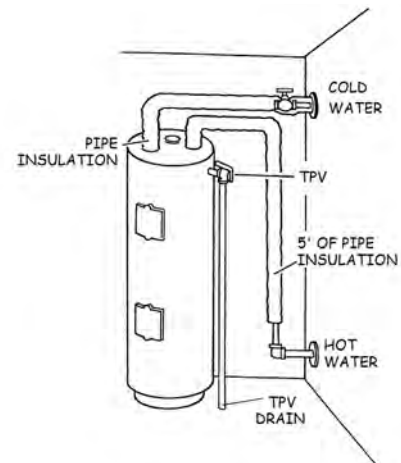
PIPE INSULATION COVERAGE REQUIREMENTS
